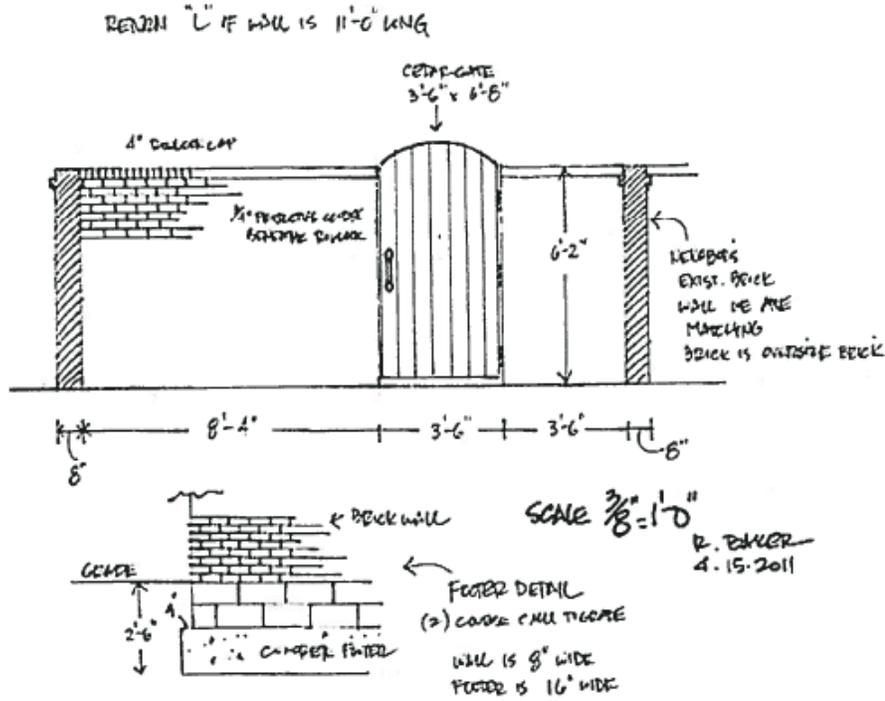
Proposed elevation of brick wall and wood gate as seen from inside the patio at 716 Gibbon.
